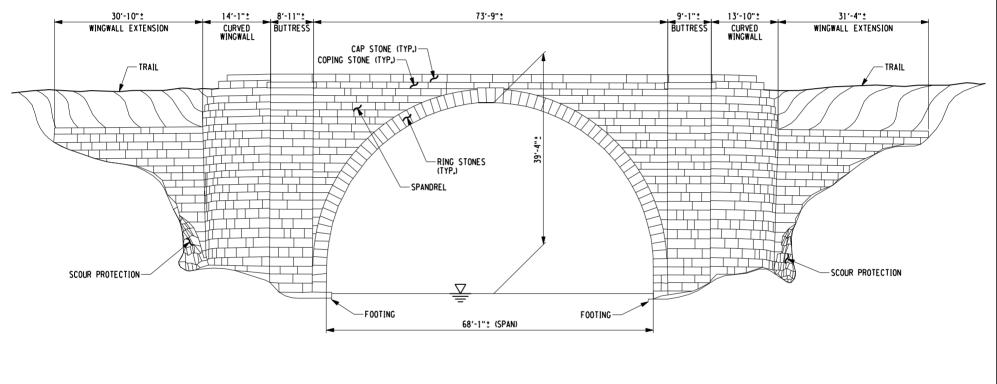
Property Sketch. Site Plan and elevation drawing from CHA measured drawings.
